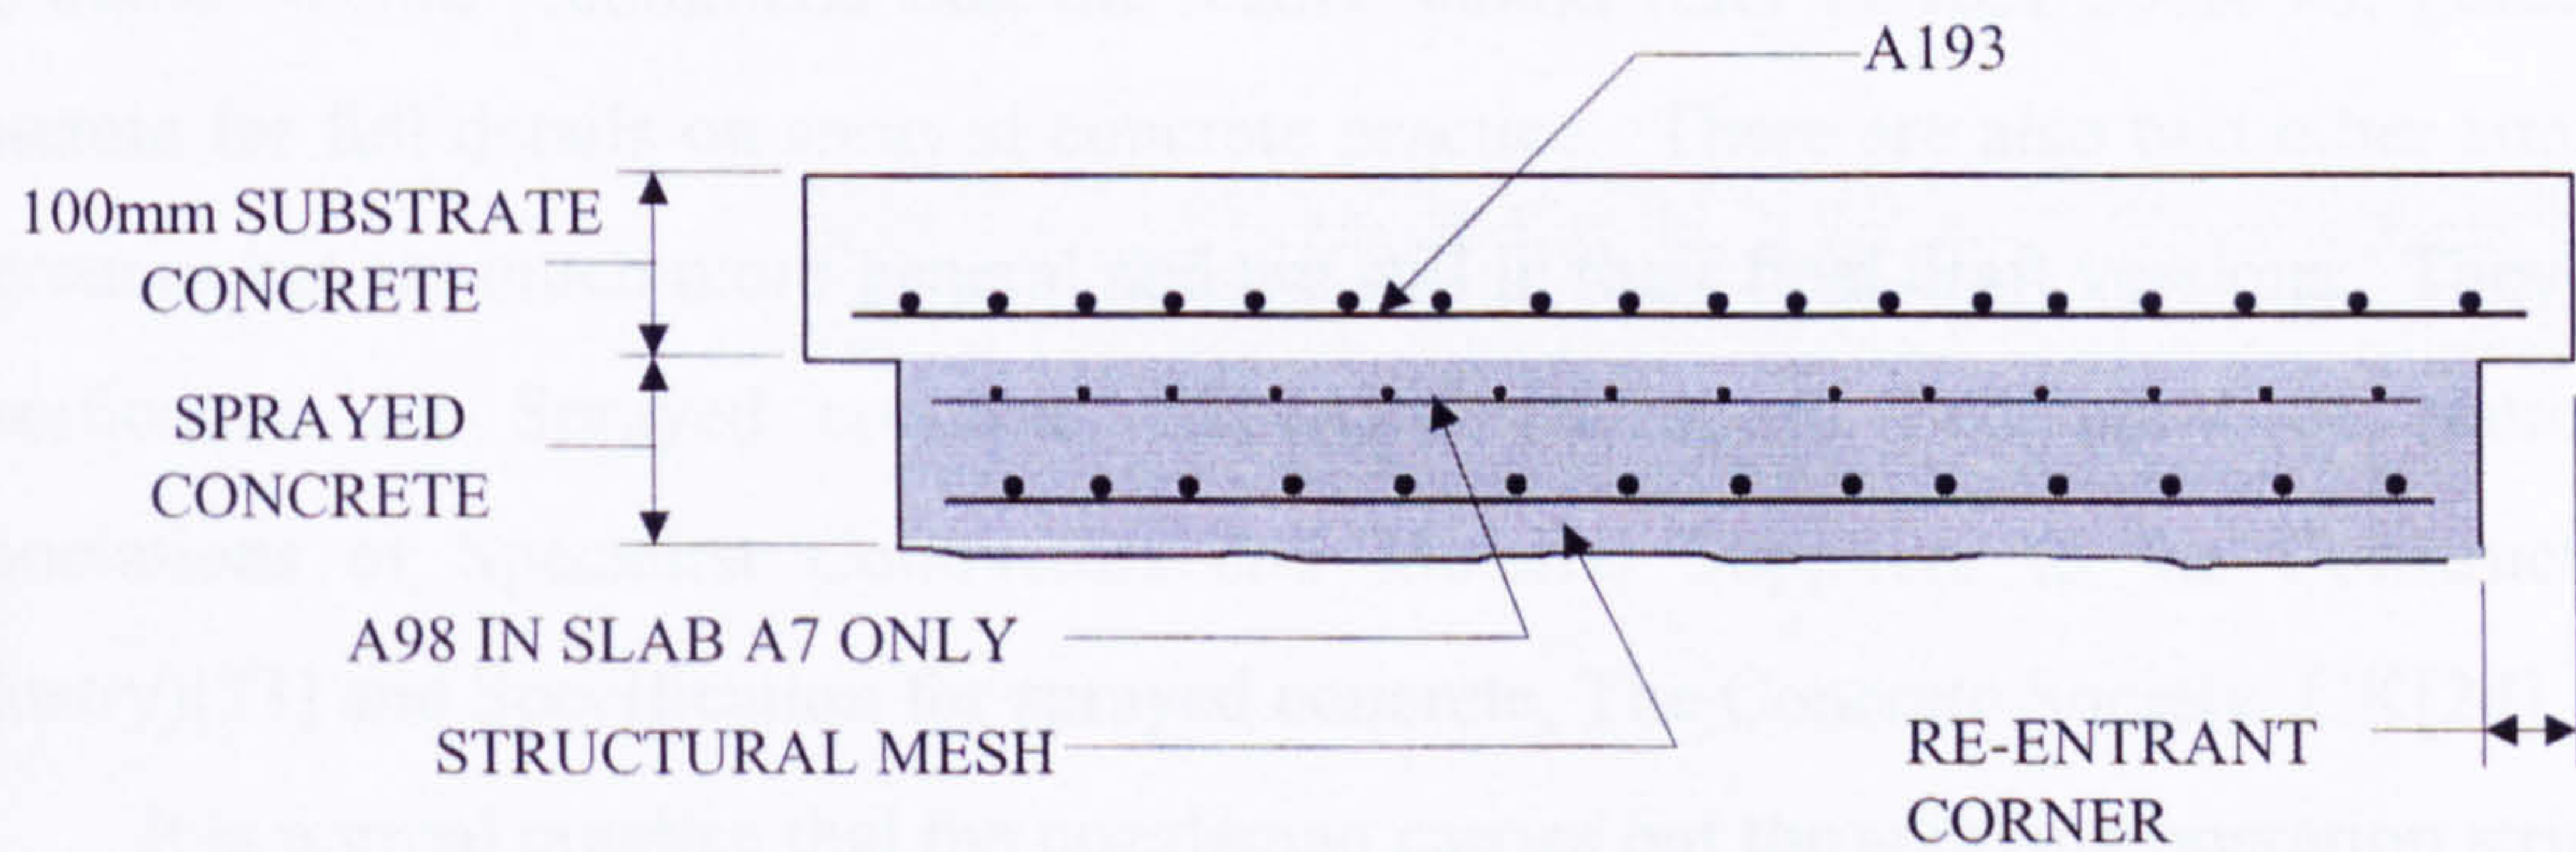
Typical test slab reinforcement details, note that the re-entrant corners (75mm) are created by the supporting timber beam.
